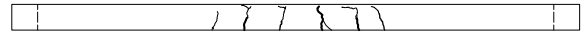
Observed Crack Pattern of Slab Specimen OF-CV-1
